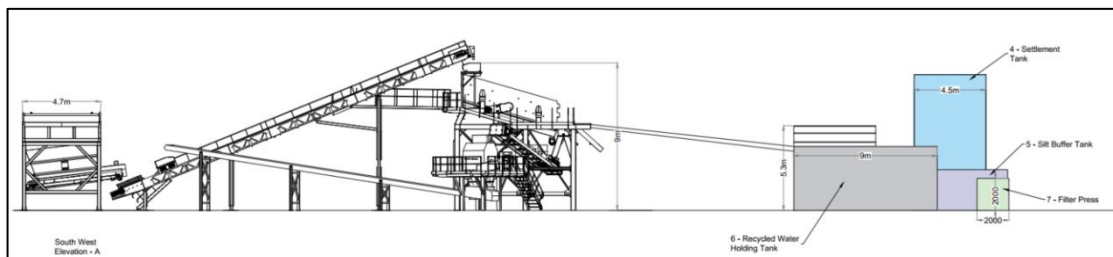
Plant Layout Elevations – Processing Area. Extracted from Planning Drawing 2111034-5
